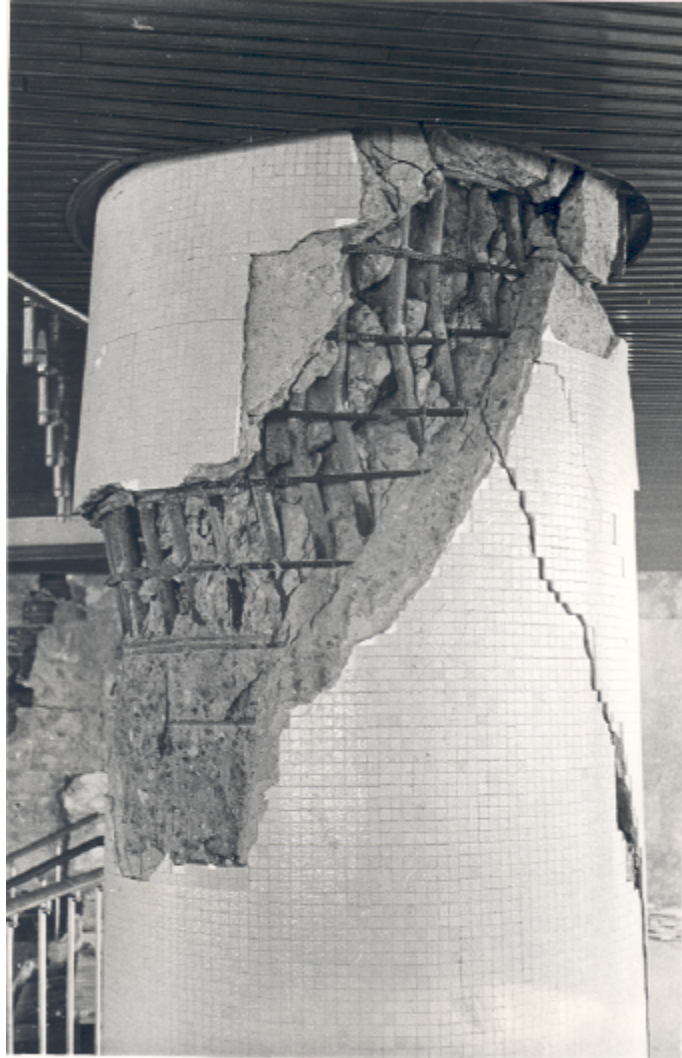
(b): Macuto Sheraton, detail of a compressed and damaged column
